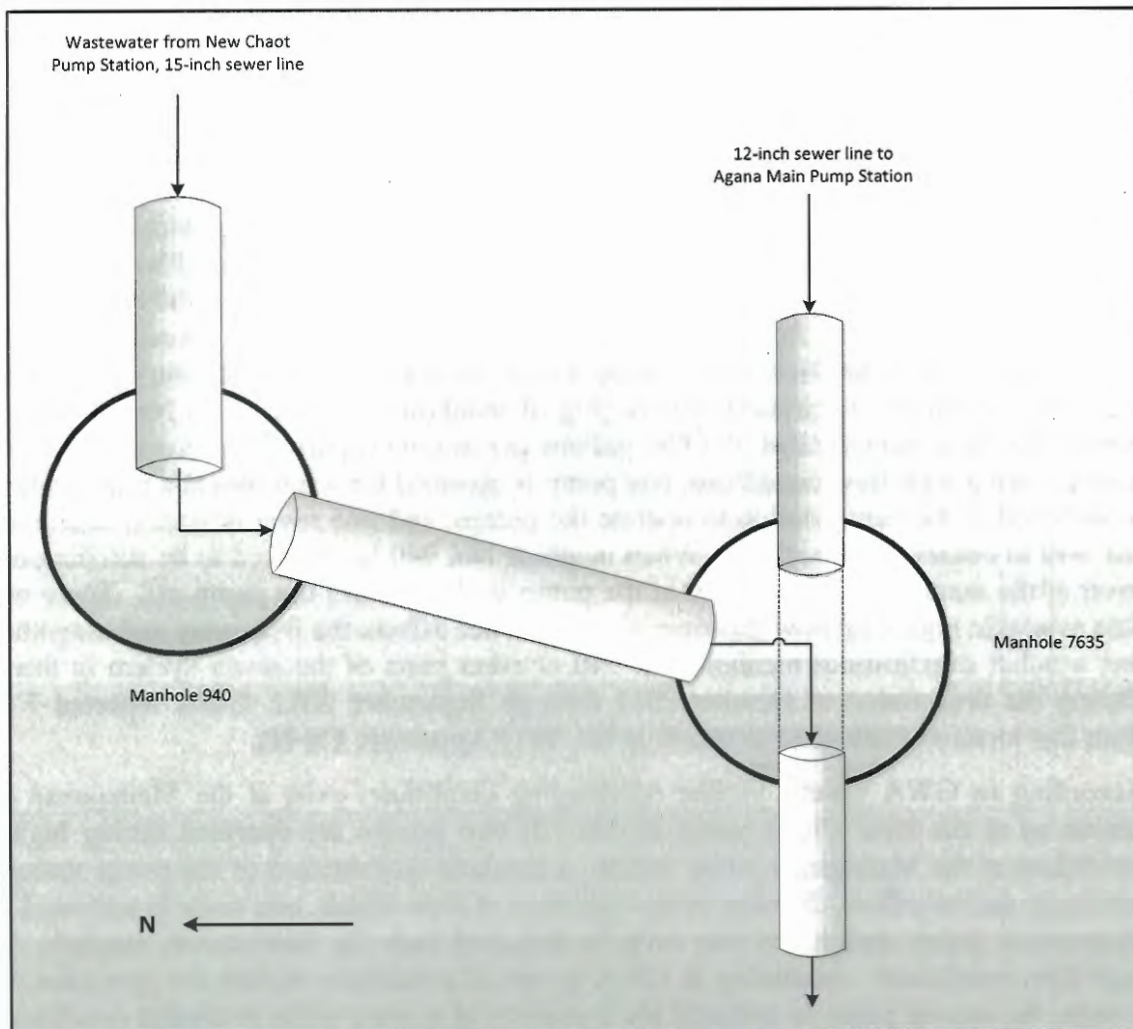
Manhole No. 940 and manhole No. 7635 wastewater flow and configuration.
